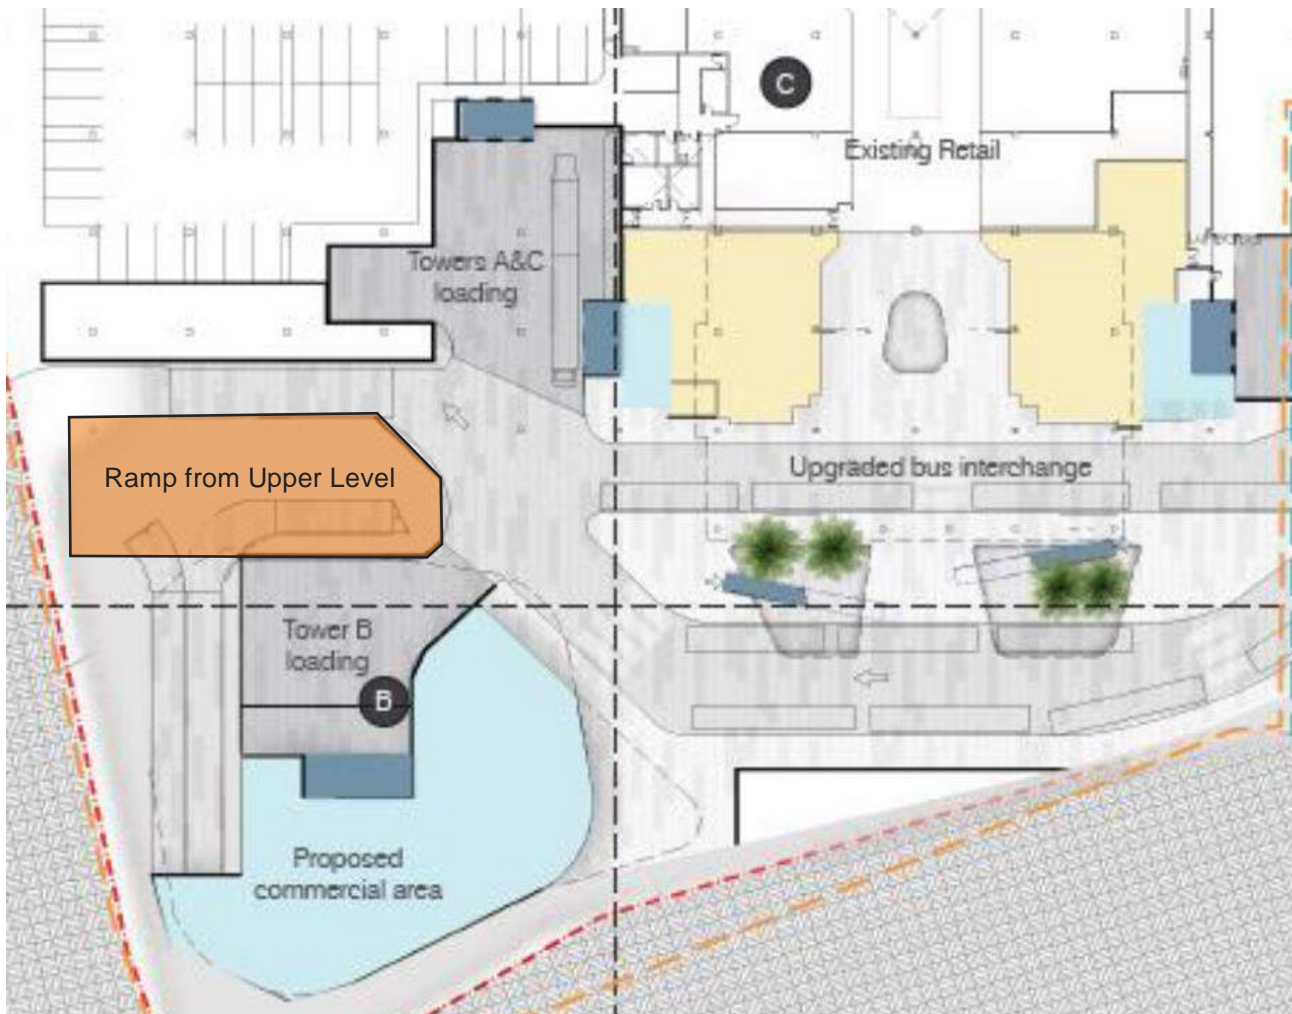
Proposed development for South-East Side of Site for Ground Floor Level (Source: Scentre Group)
